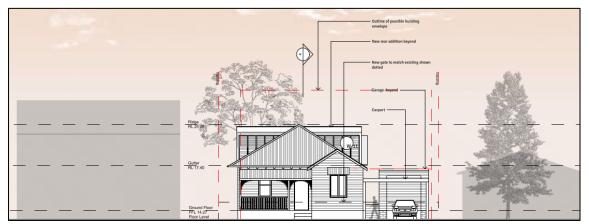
Proposed Eastern Elevation (Rochester Street)
